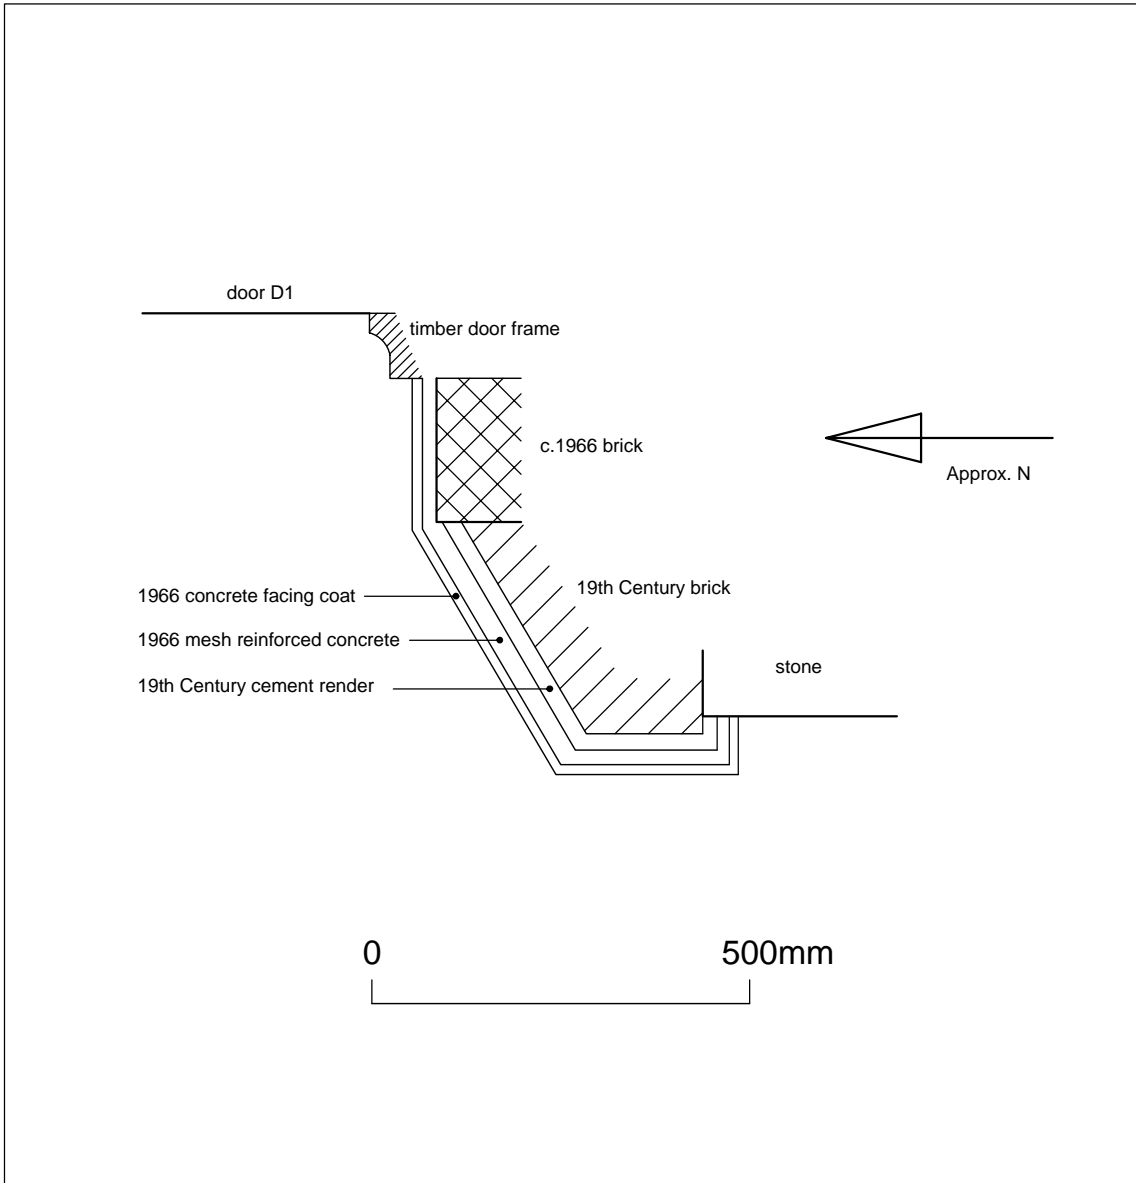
Plan view illustrating sequence of materials forming surround to doorway D1 (Area 1)
